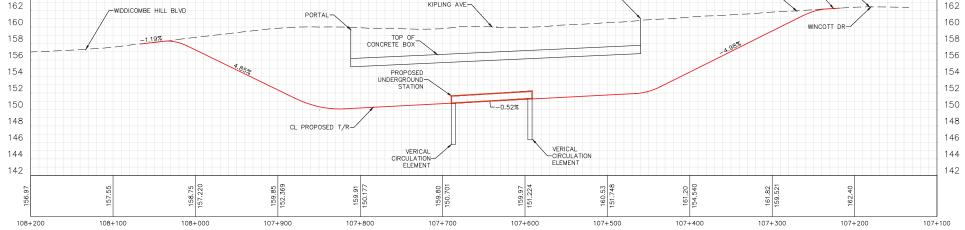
Plan and profile of the grade separation that was studied at Kipling/Eglinton.
